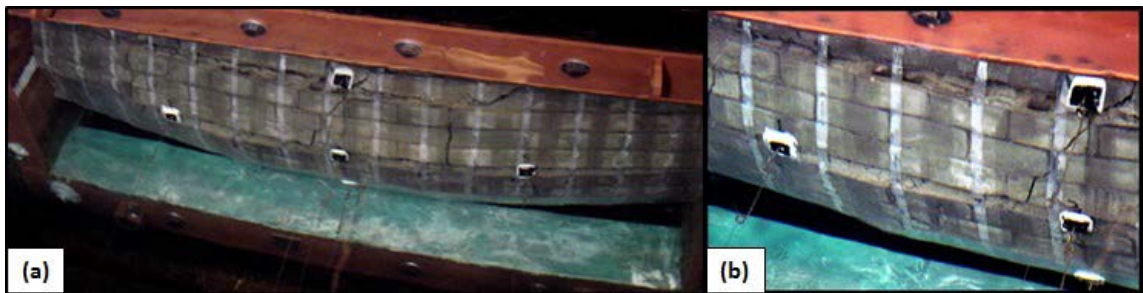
SW18. (a) Cracks in wall are visible as the wall deforms. (b) Cracks in the mortar joint continue to enlarge as the wall deforms.
